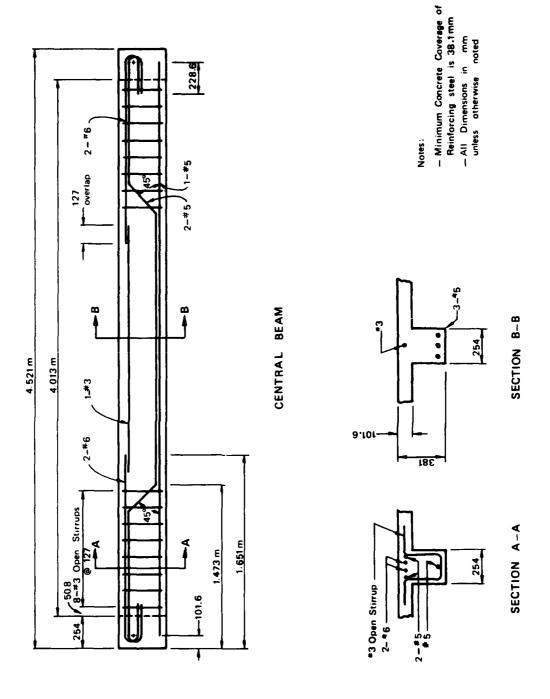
STRUCTURAL DETAILS OF CENTER BEAM - WES TEST 1
